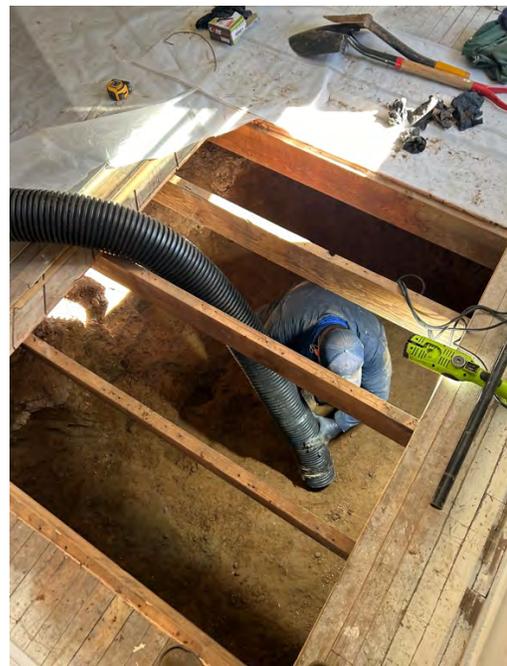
Contaminated soil was removed from AST area. View is of the vacuum excavation.
